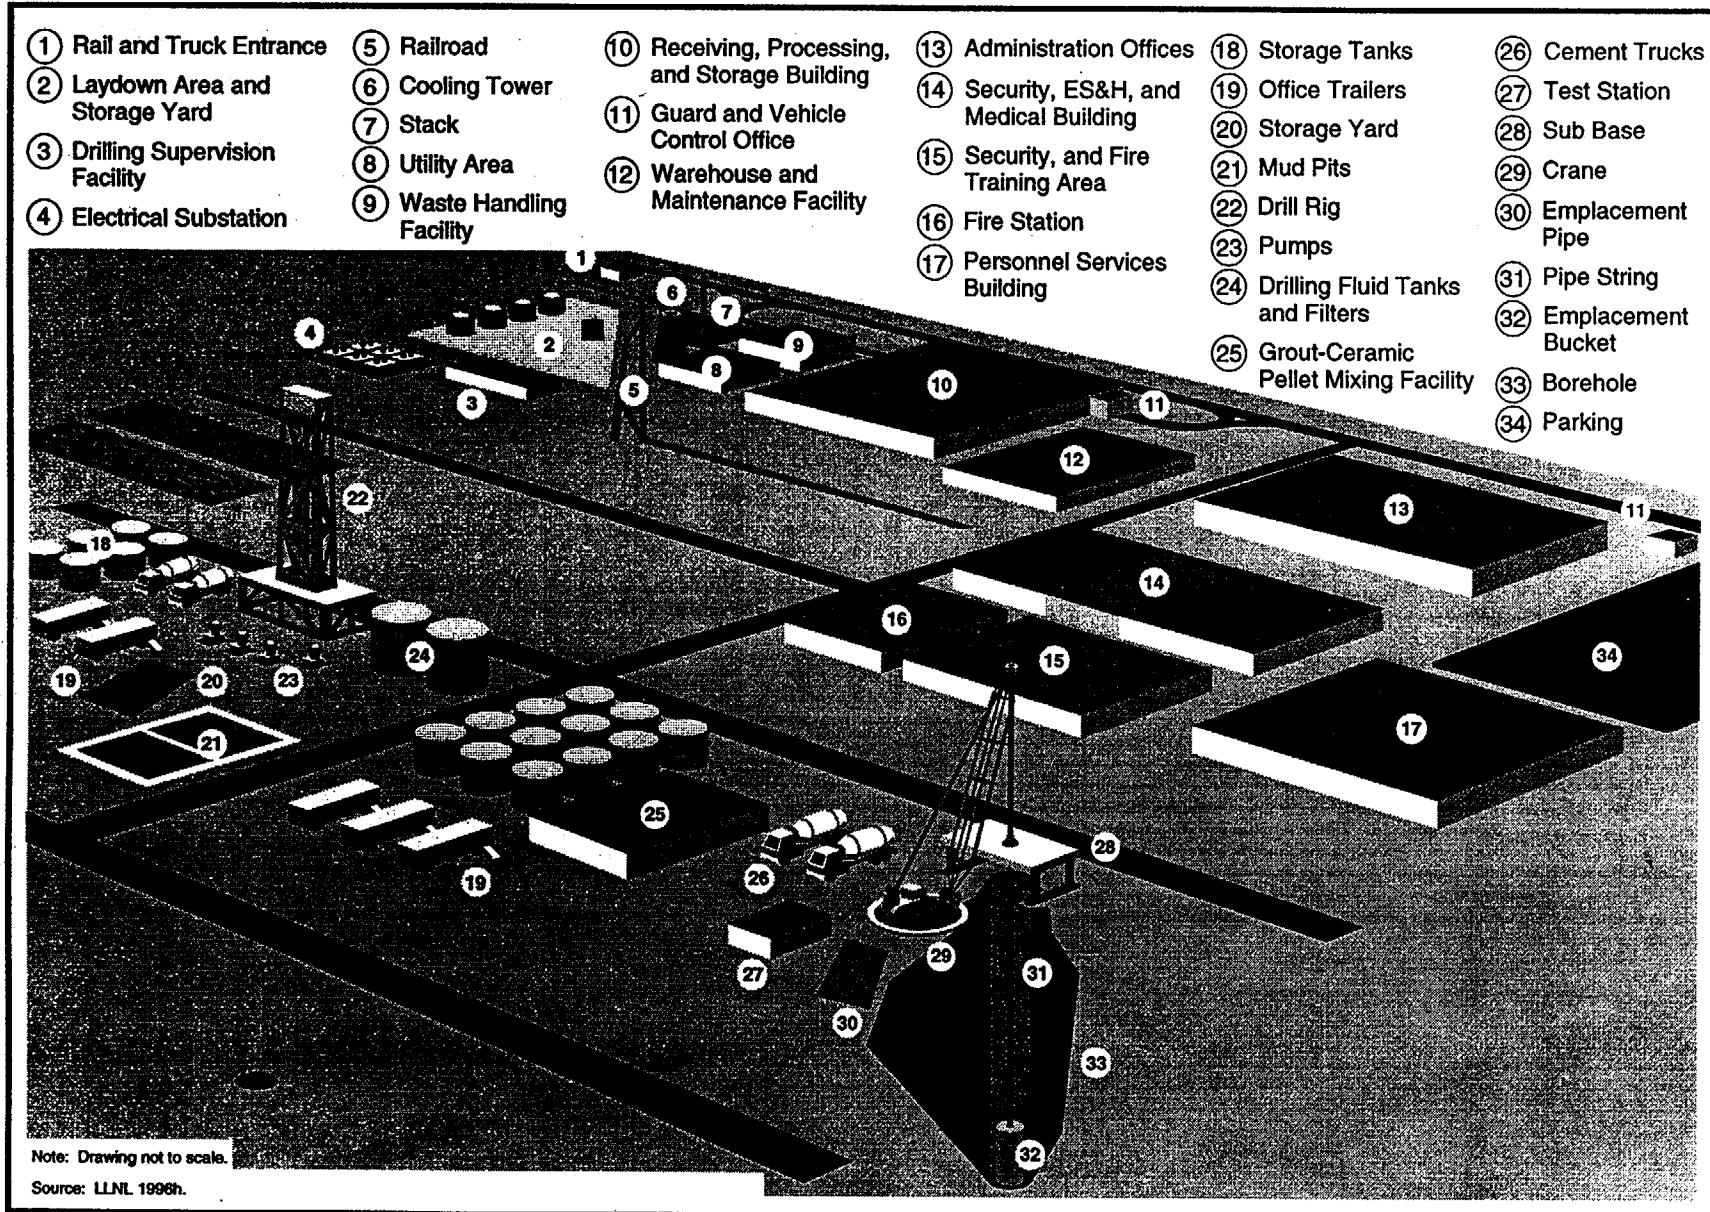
Conceptual Deep Borehole Facility Site Layout (Perspective).
